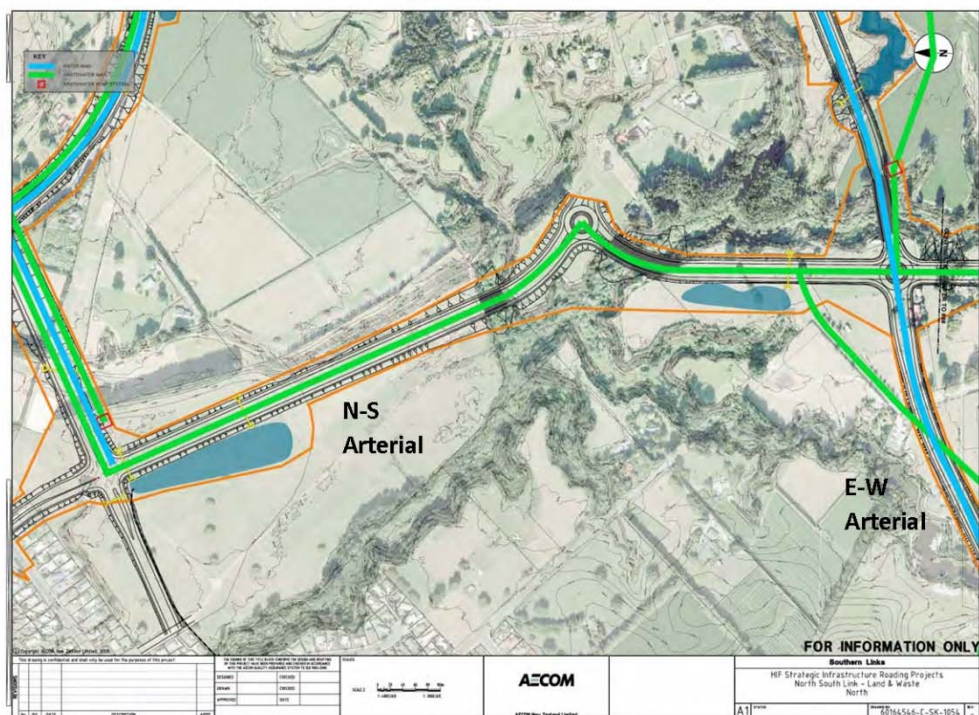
North-South arterial wastewater to allow additional development near Stage 1 of Peacocke
